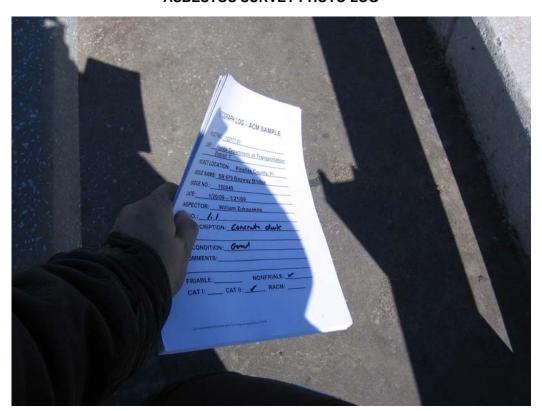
01/21/09 – SAMPLE 1.1 – HA 1 CONCRETE BRIDGE DECK AND COLUMNS
